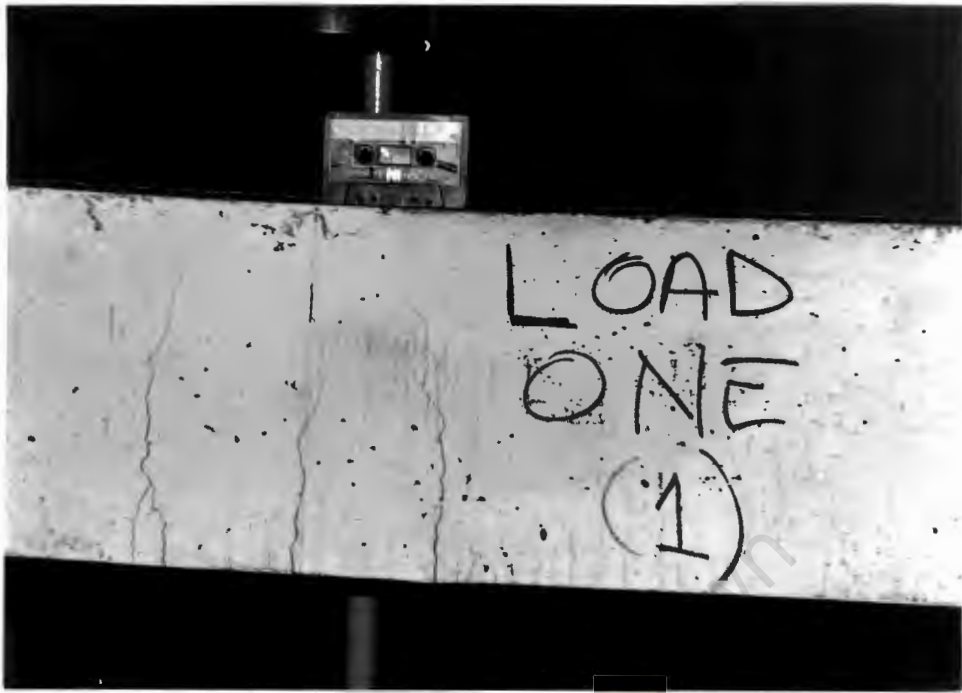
Tensile cracking under Load One - beam FS5 at failure.
